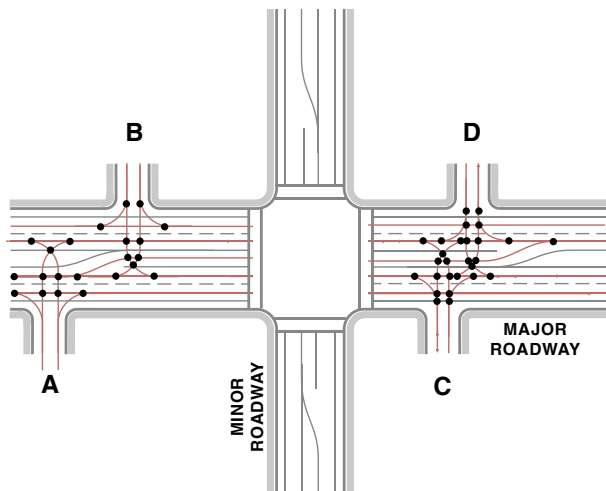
Typical Access Scenario at the Intersection of Two Public Roadways
